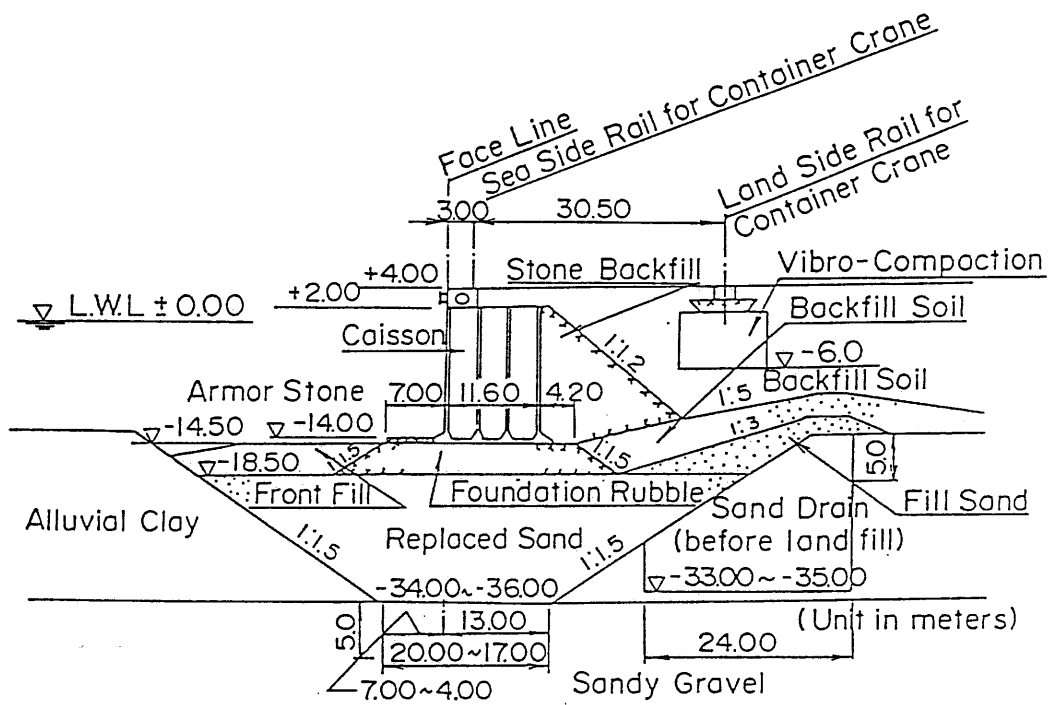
Typical Caisson Foundation. (From Inagaki *et al*, 1996.)
